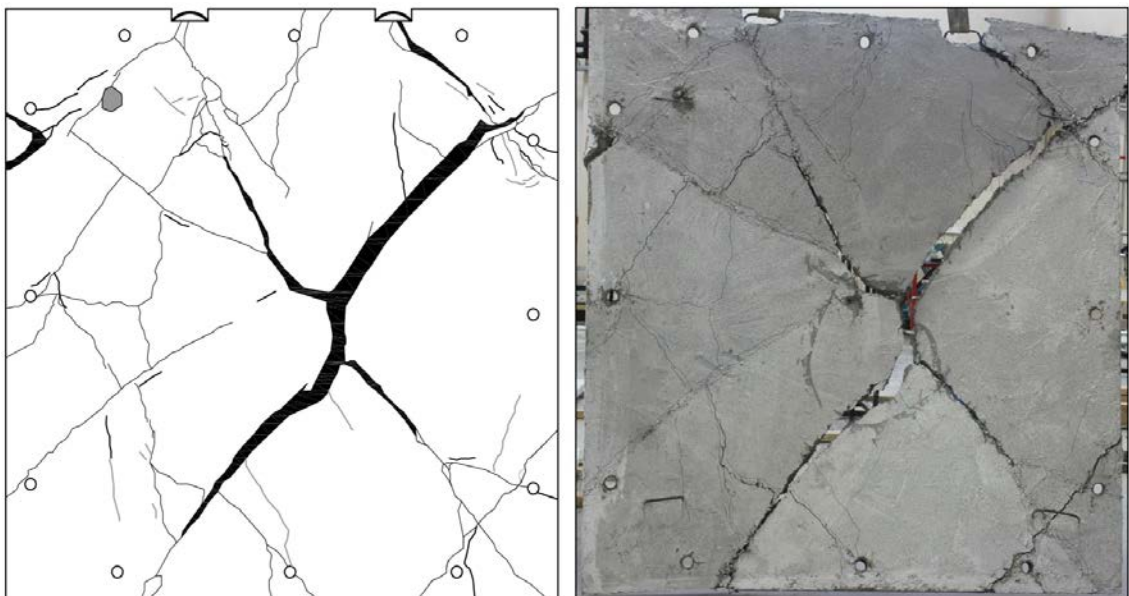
Front Face Crack Patterns After Testing for Panel JA2-075-Perlite+PVA
